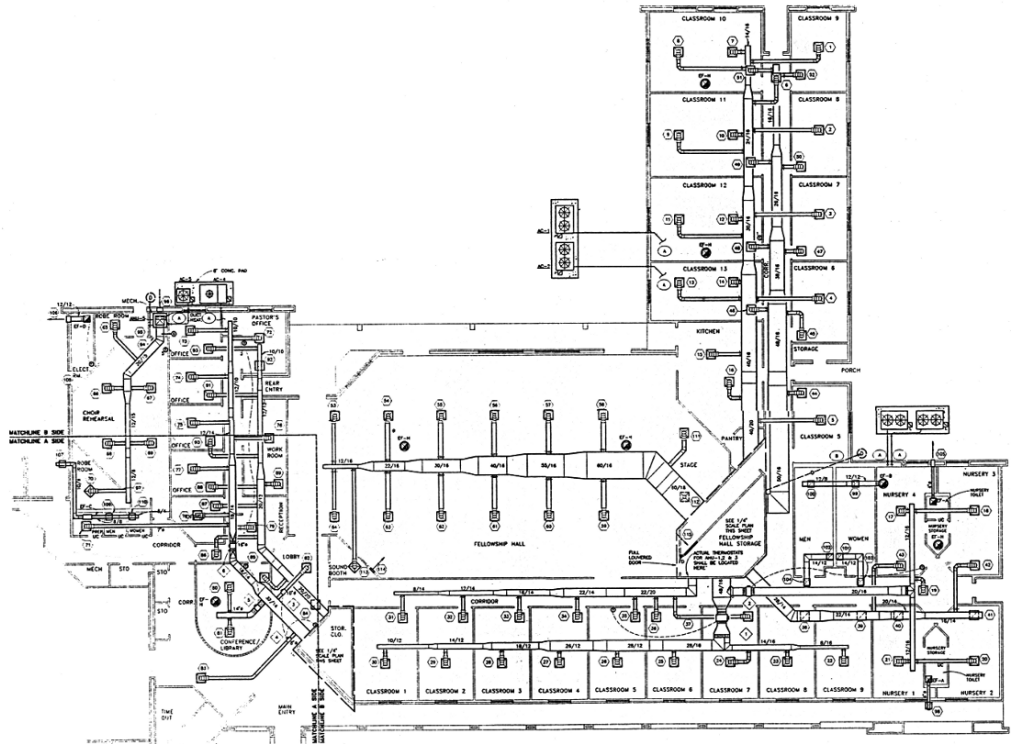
Mechanical plan (north wing only) of the Wildwood church; note the many air-cooled condensers located adjacent to the building.
